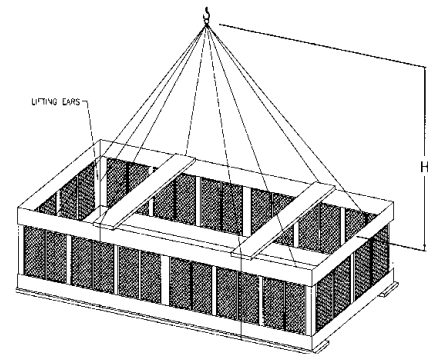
Proper Rigging Method for Extended Lifts. UBT Models.
